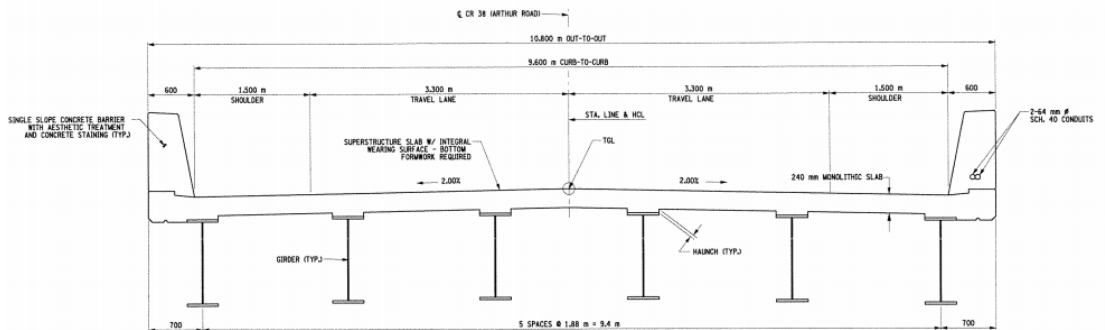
Cross section of Arthur Road Bridge over I-87 S.B.
